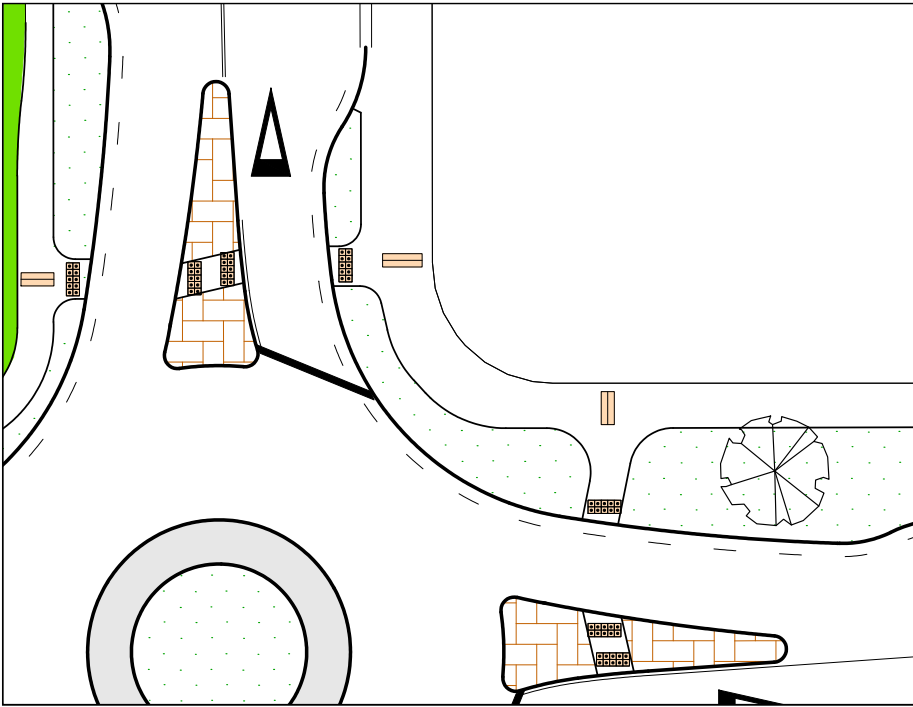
This example shows the recommended layout of warning and directional TGS at a roundabout
